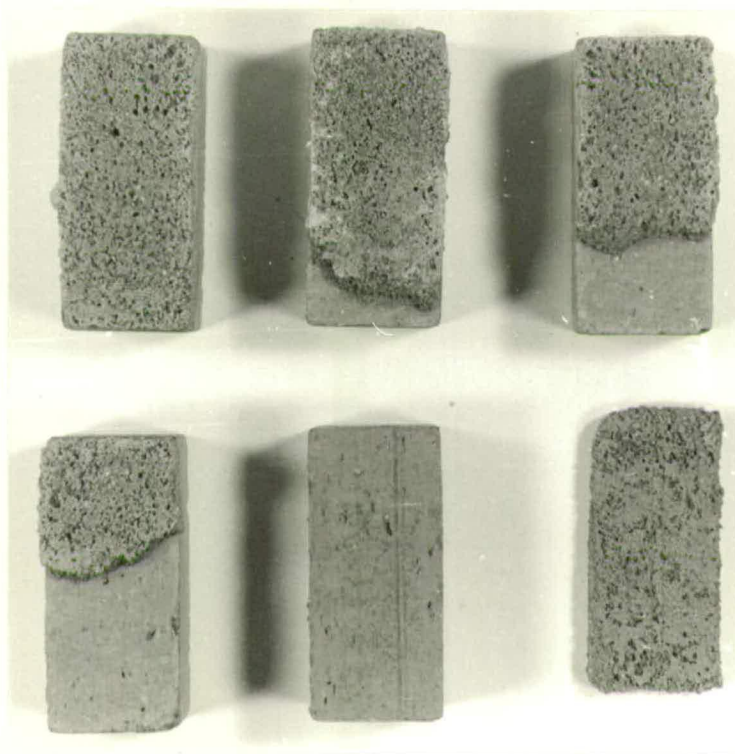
Typical failure stages of couplets in bond shear test.
